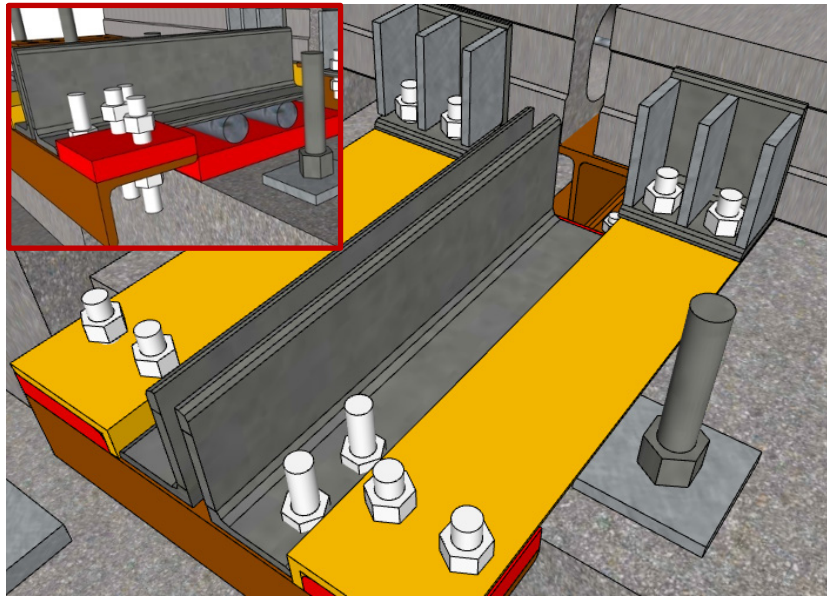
Part of the assembly at the end of connection (the steel angle beams -yellow color-are not shown in the framed drawing for clarity).
